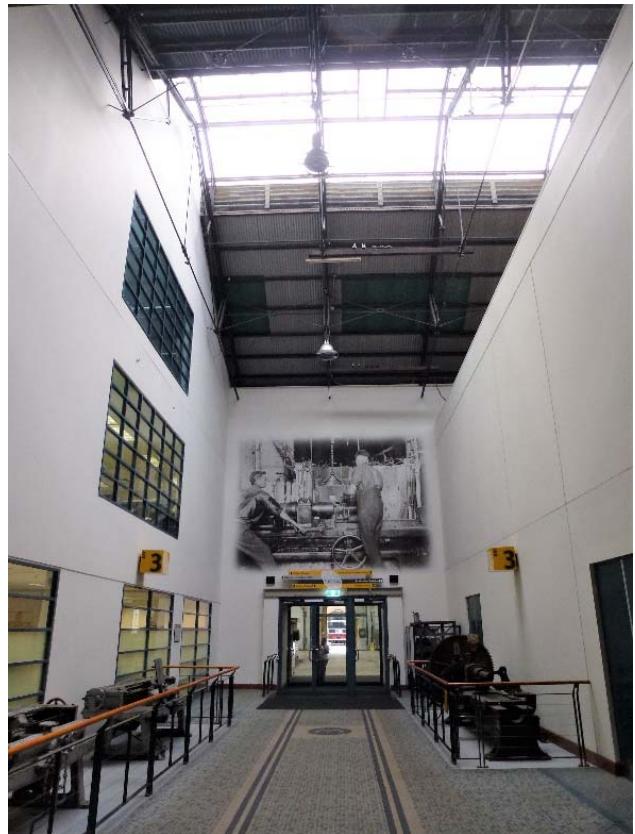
View of the existing wall and doorway separating Bays 2 and 3 from Bay 3
